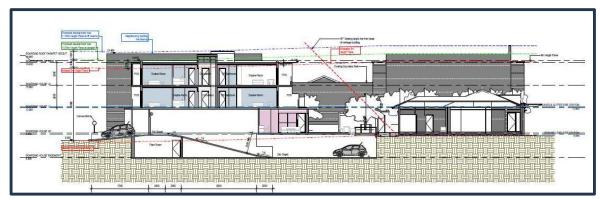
Section detailing Area of Height Exceedance and FFL for Ground level (Source: Mode).
